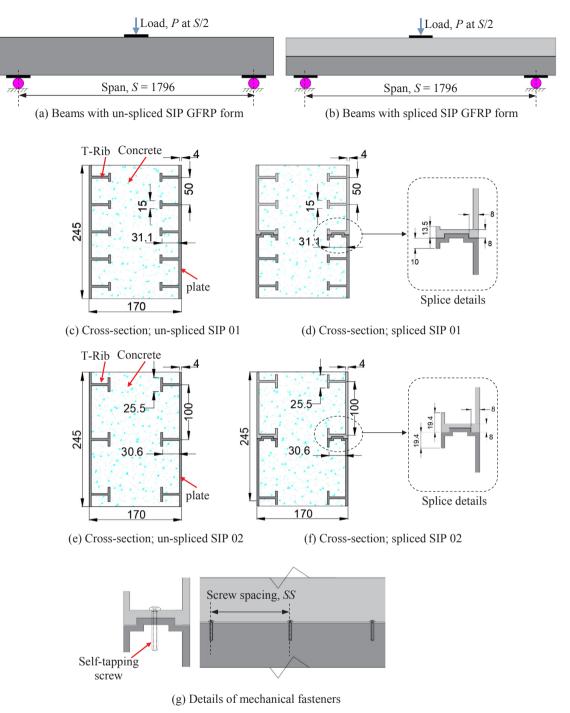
Geometry of concrete beams reinforced by GFRP SIP form (dimensions in mm).
